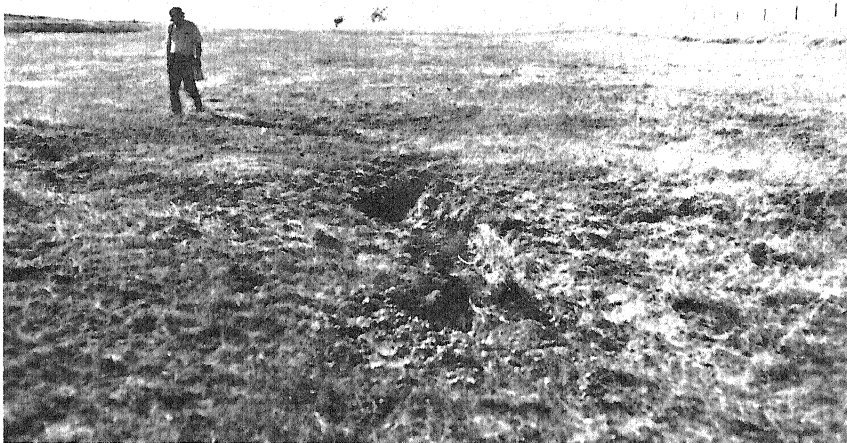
Small gully at outlet end of site 30 emergency spillway. Concentration of flow and the poor cover may have caused this minor failure.
